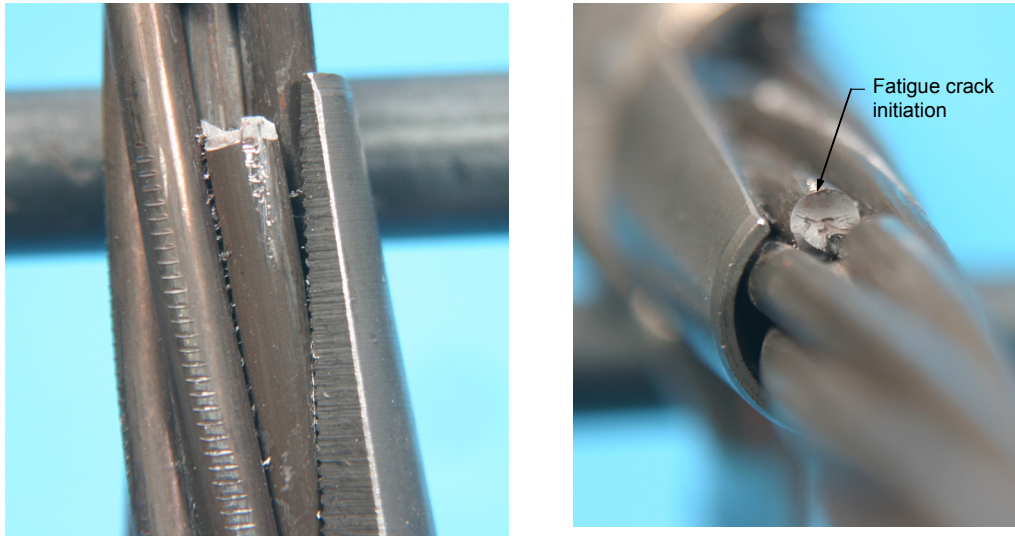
Wire breaks on strand 9 at wedge on tower end - Specimen 8
